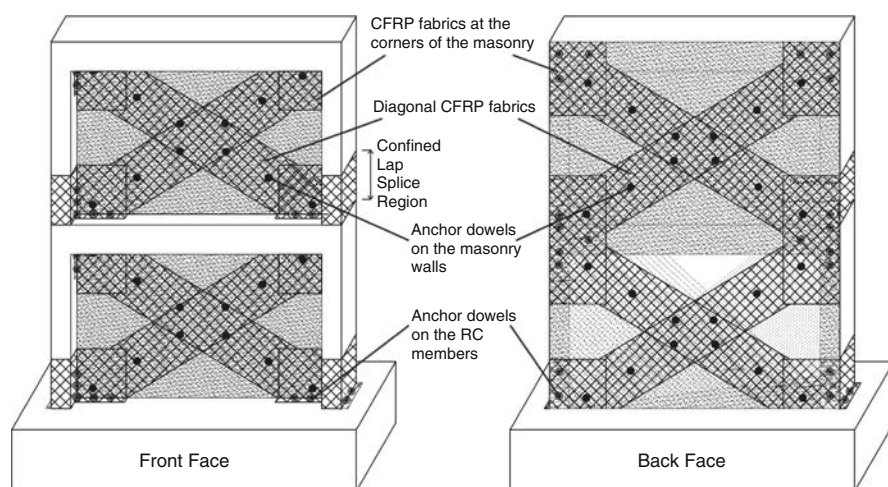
The CFRP strengthening applied on the frame and location of the anchors
